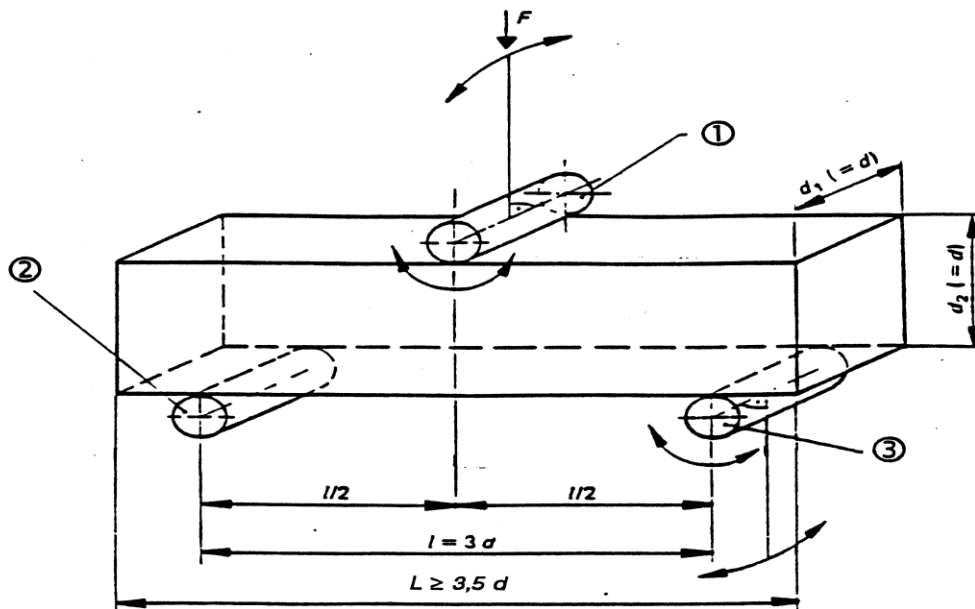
Center-Point Loading Arrangement for Test Specimen (BS EN 12390-5)
